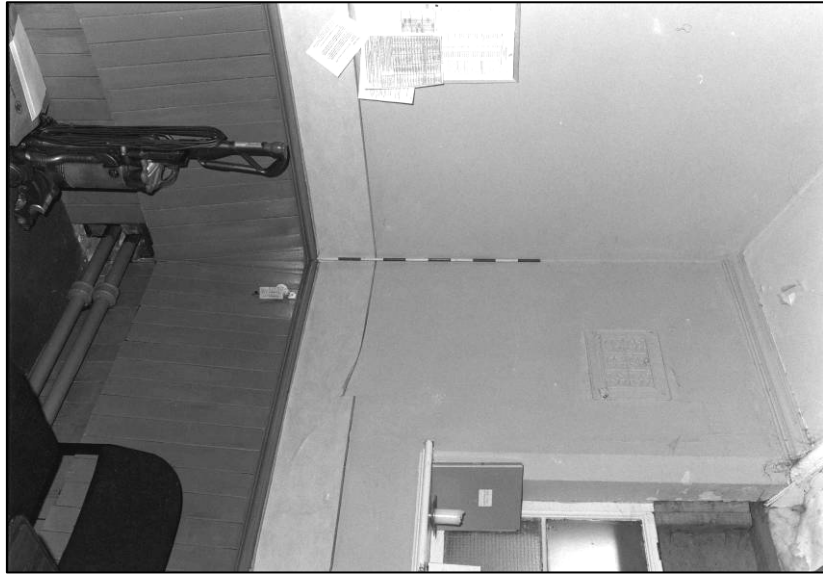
School: GF, typical side room off main hall (N side), looking NW (photo 12/3) (top to right).
